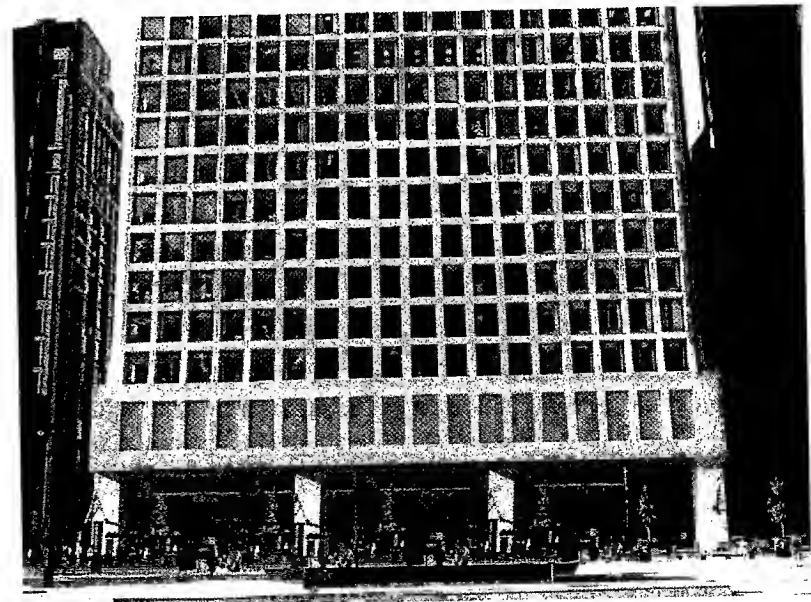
Deep beam supporting columns (Brunswick Building, Chicago)
